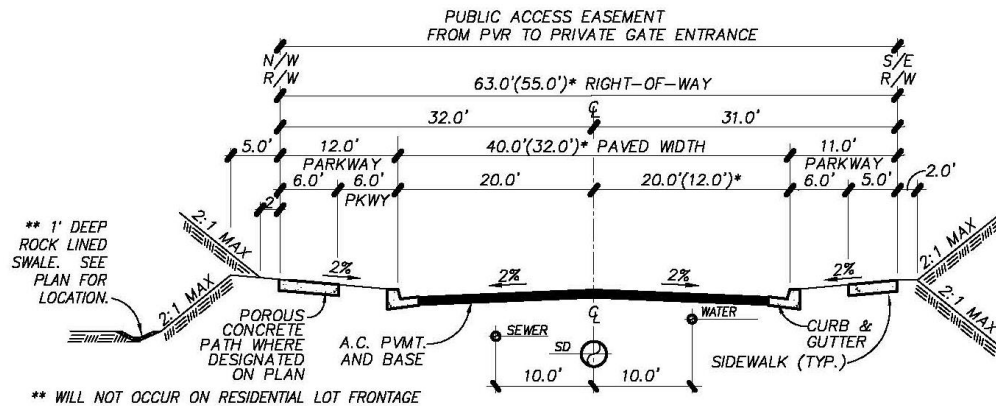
Street Section 8- Modified Residential Collector (54' – 62' ROW)
